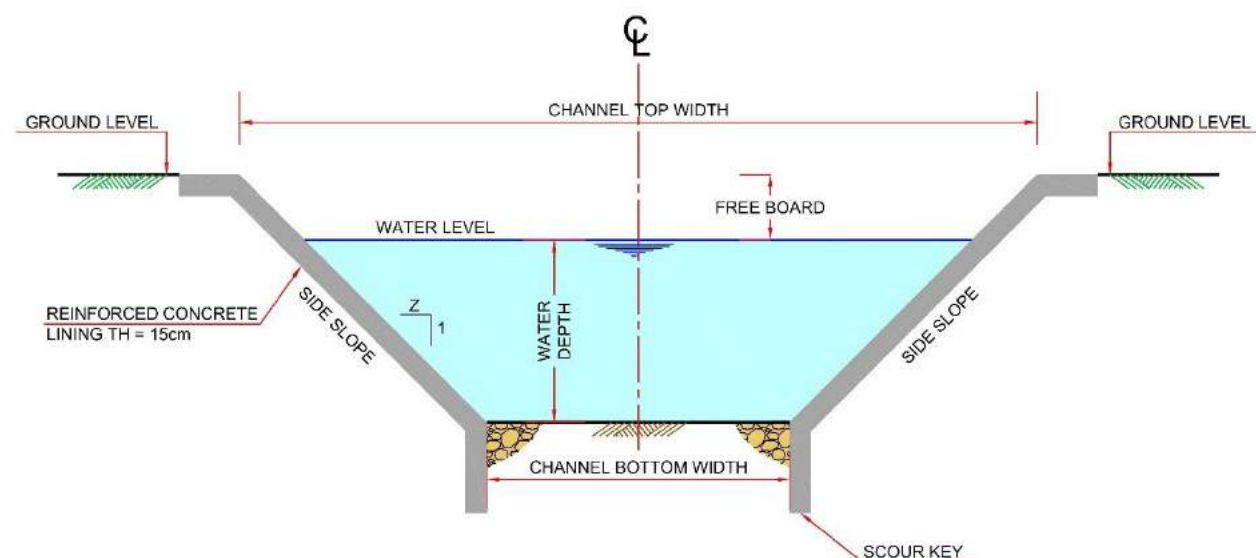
Typical Cross-Section for a Concrete Lined Channel Sides and Natural Bed
